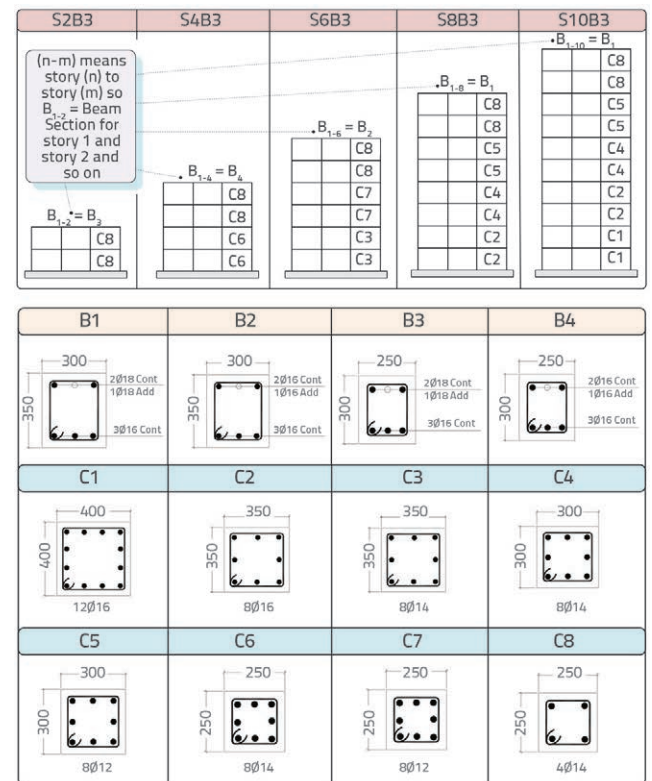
Section properties for all frames in step 1: a) location of each section through the frames; b) section properties for beams and columns (B - beam; C - column)
